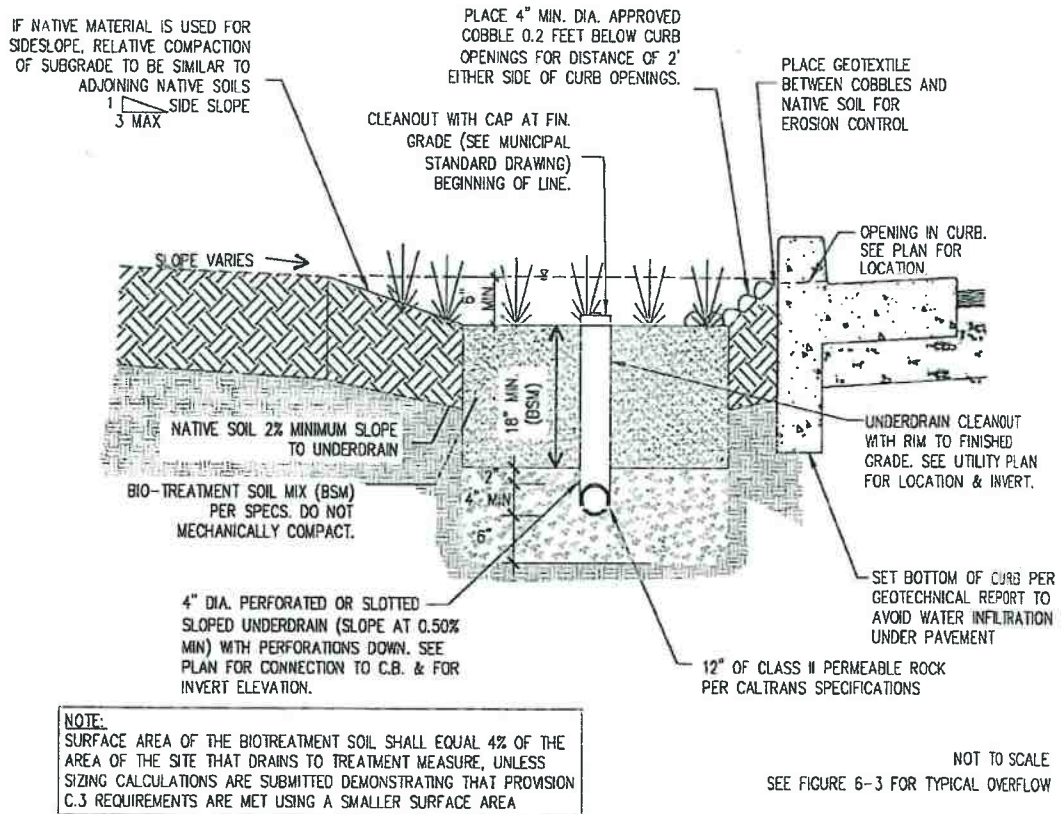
Cross section of bioretention area showing inlet from pavement.
